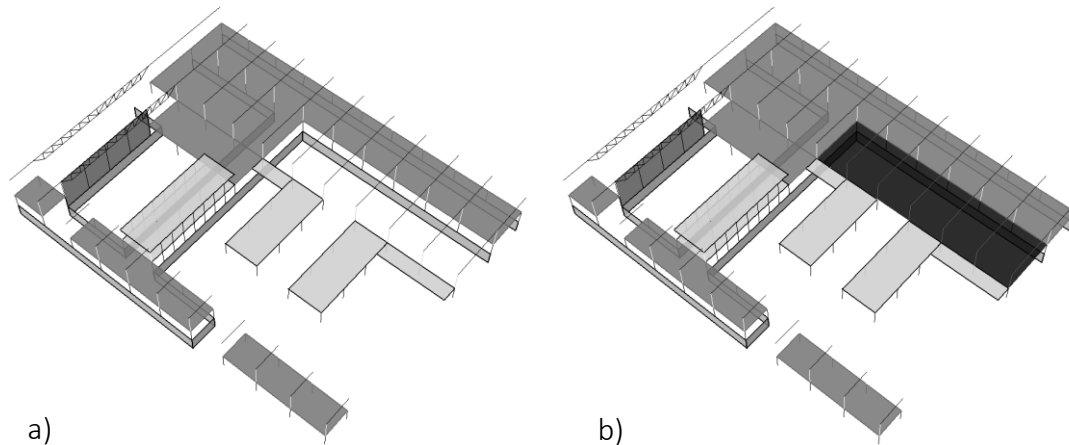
a) Illustrates the existing area of the domestic terminal and the darker part in figure b) illustrates where the new floor system should be placed.
